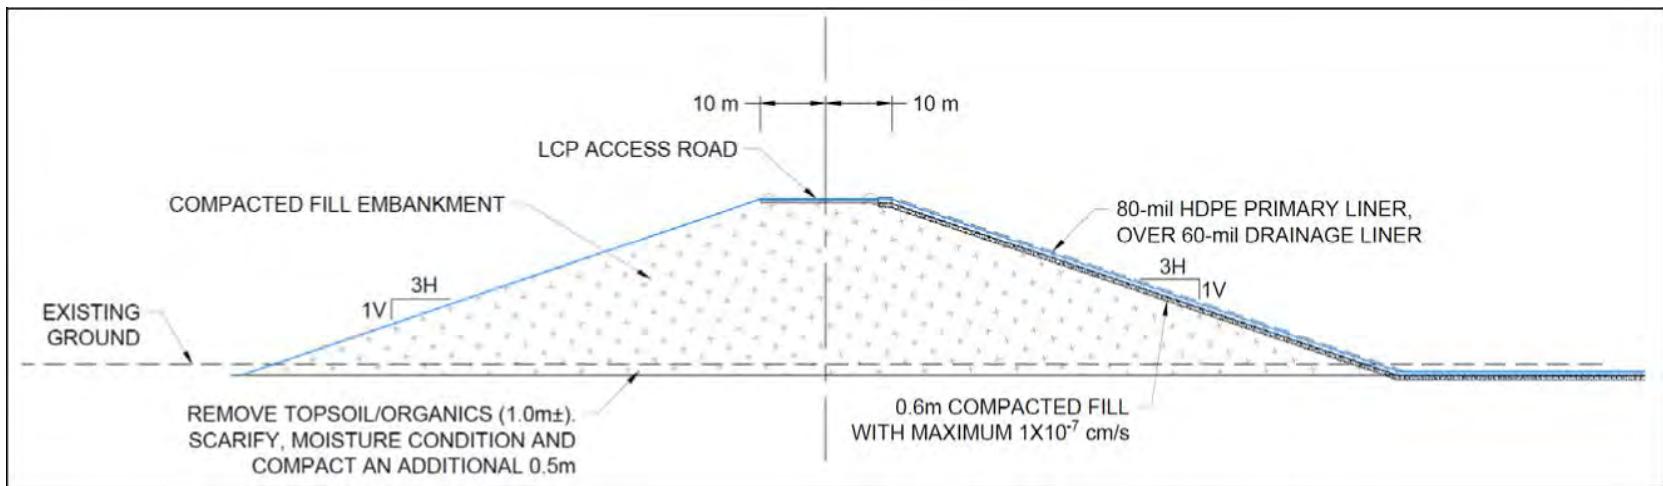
Leachate Collection Pond Embankment Cross-Section
